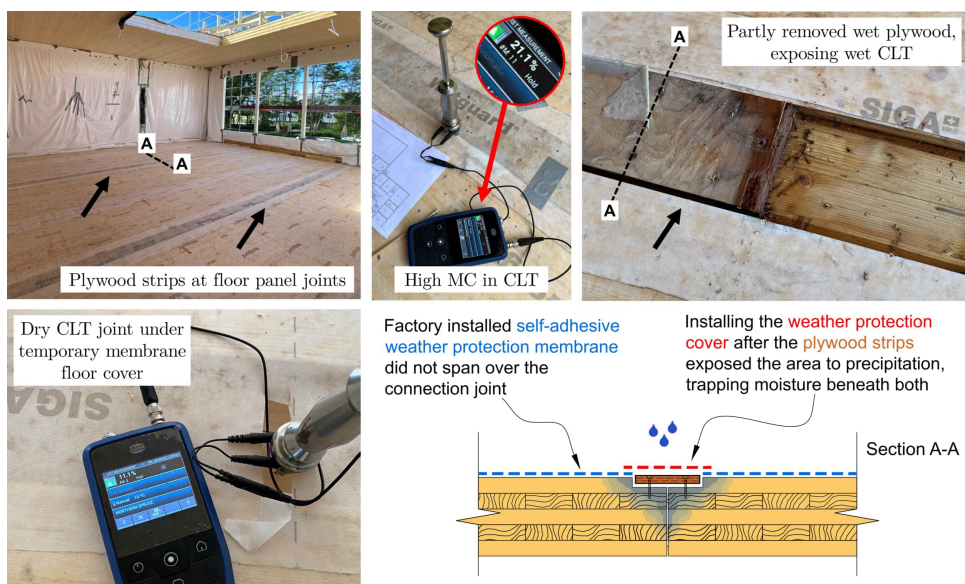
In building G, water infiltration at CLT floor joints raised moisture content above 20%. Initially, a plywood strip was installed before the weather protection membrane, but in a revised method the membrane was installed first, ensuring a dry connection.
